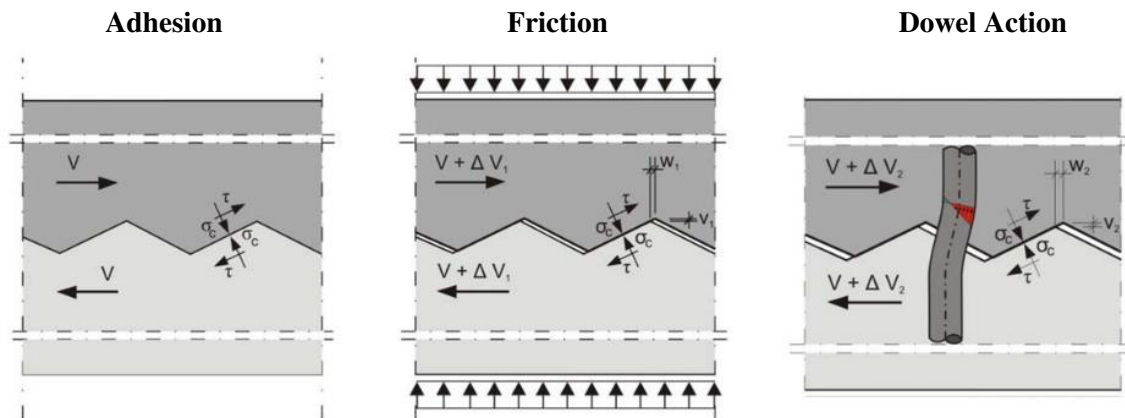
Resisting mechanism for concrete-to-concrete interfaces with steel connectors (adapted from [24]).
